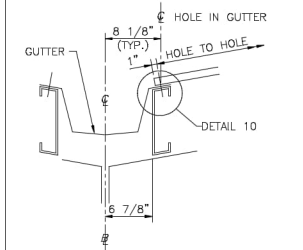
MR-24 SEAMED RIDGE ROOF SYSTEM
